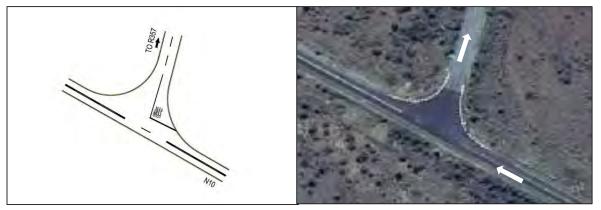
Geometric layout and aerial view of the N10 intersection
